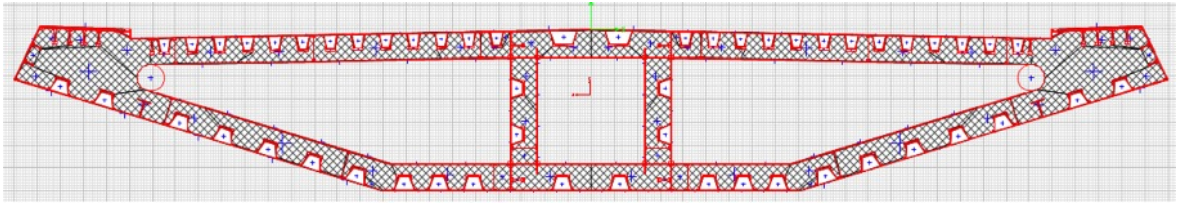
FEM cross-section of main span of New Kömürhan Bridge.
